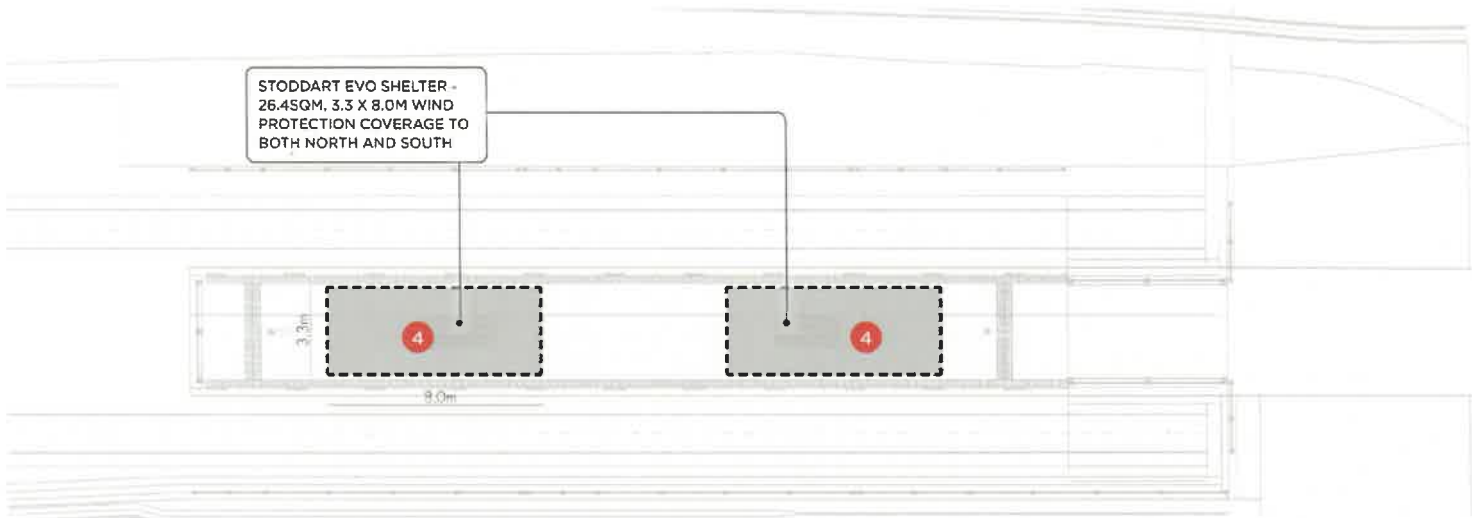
Platform shelter roof plan numbers relate to materials palette key:
